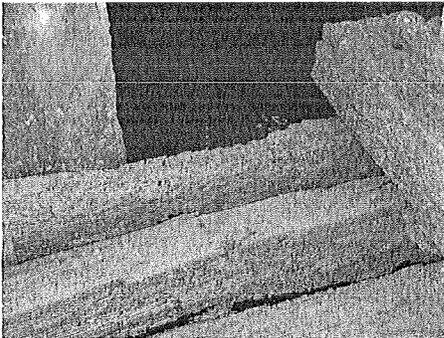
Typical grillage in poor condition with section loss and severe worm damage.
